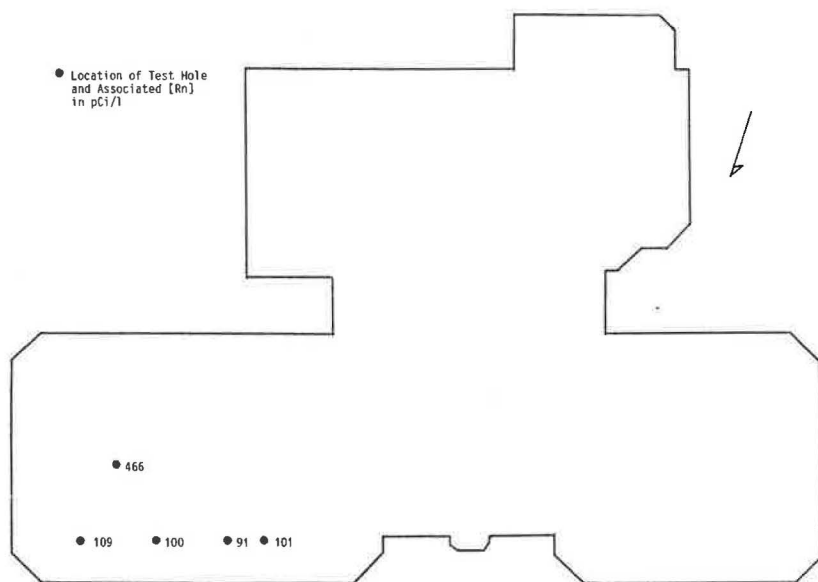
Subslab radon measurements; slabs in place approximately 7 months; most construction complete (March 1988)
